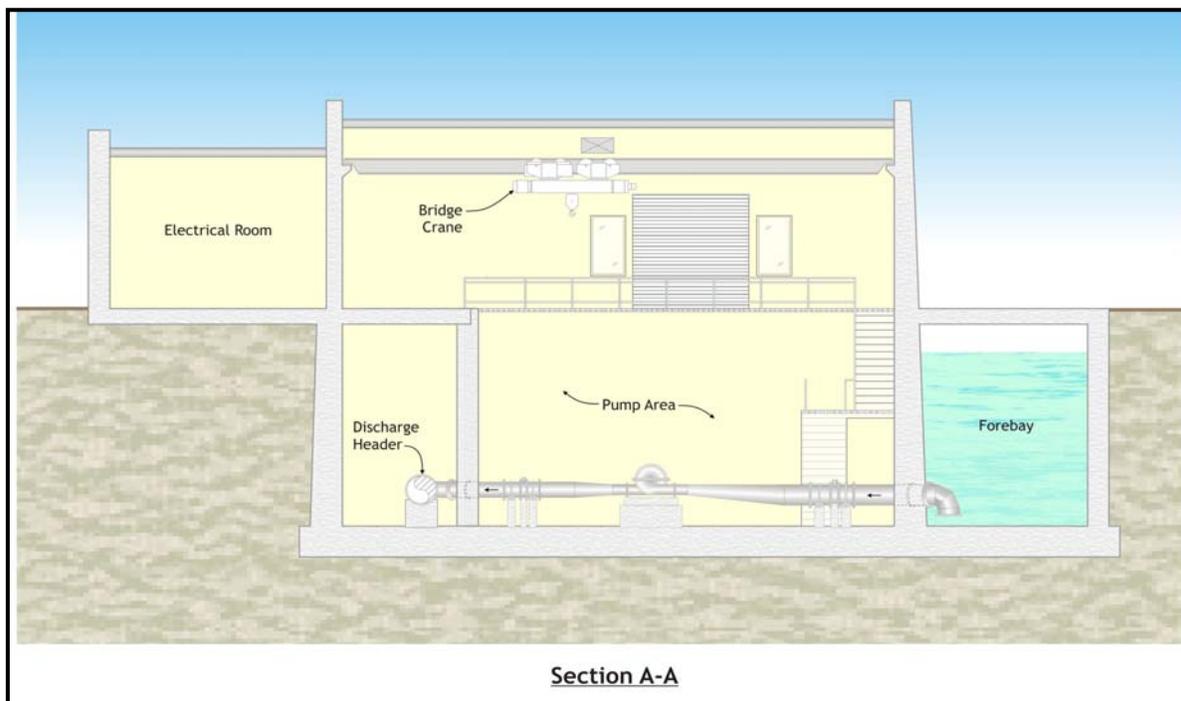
Pumping Station Layout, Conceptual Cross Section
